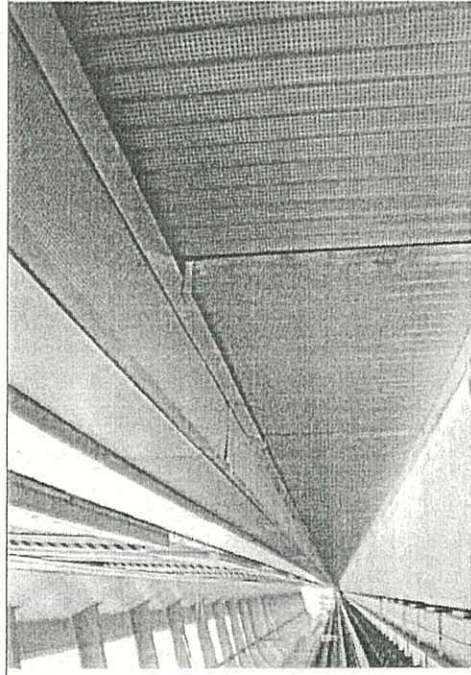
Acoustic Panels Installed Underside of the Station Platform at TIS
